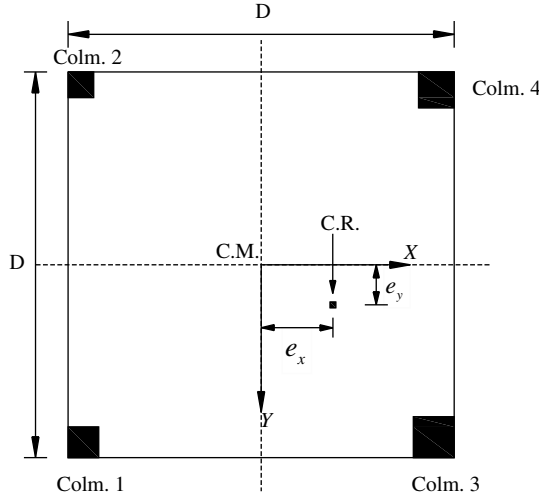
Plan of the one-storey 3D frame with a rigid slab
